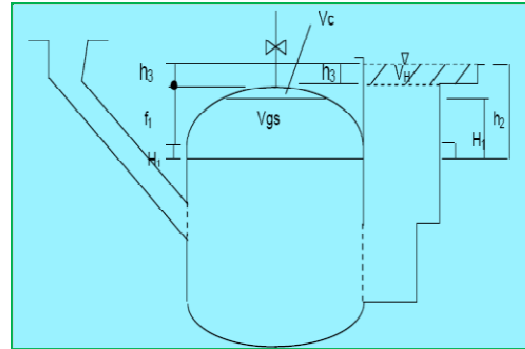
Complete drawing of cylindrical torpisspherical fixed dome digester
